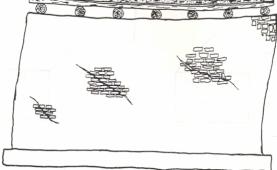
Shear Wall Collapse Mode (After Dr Tariq Rafey)
